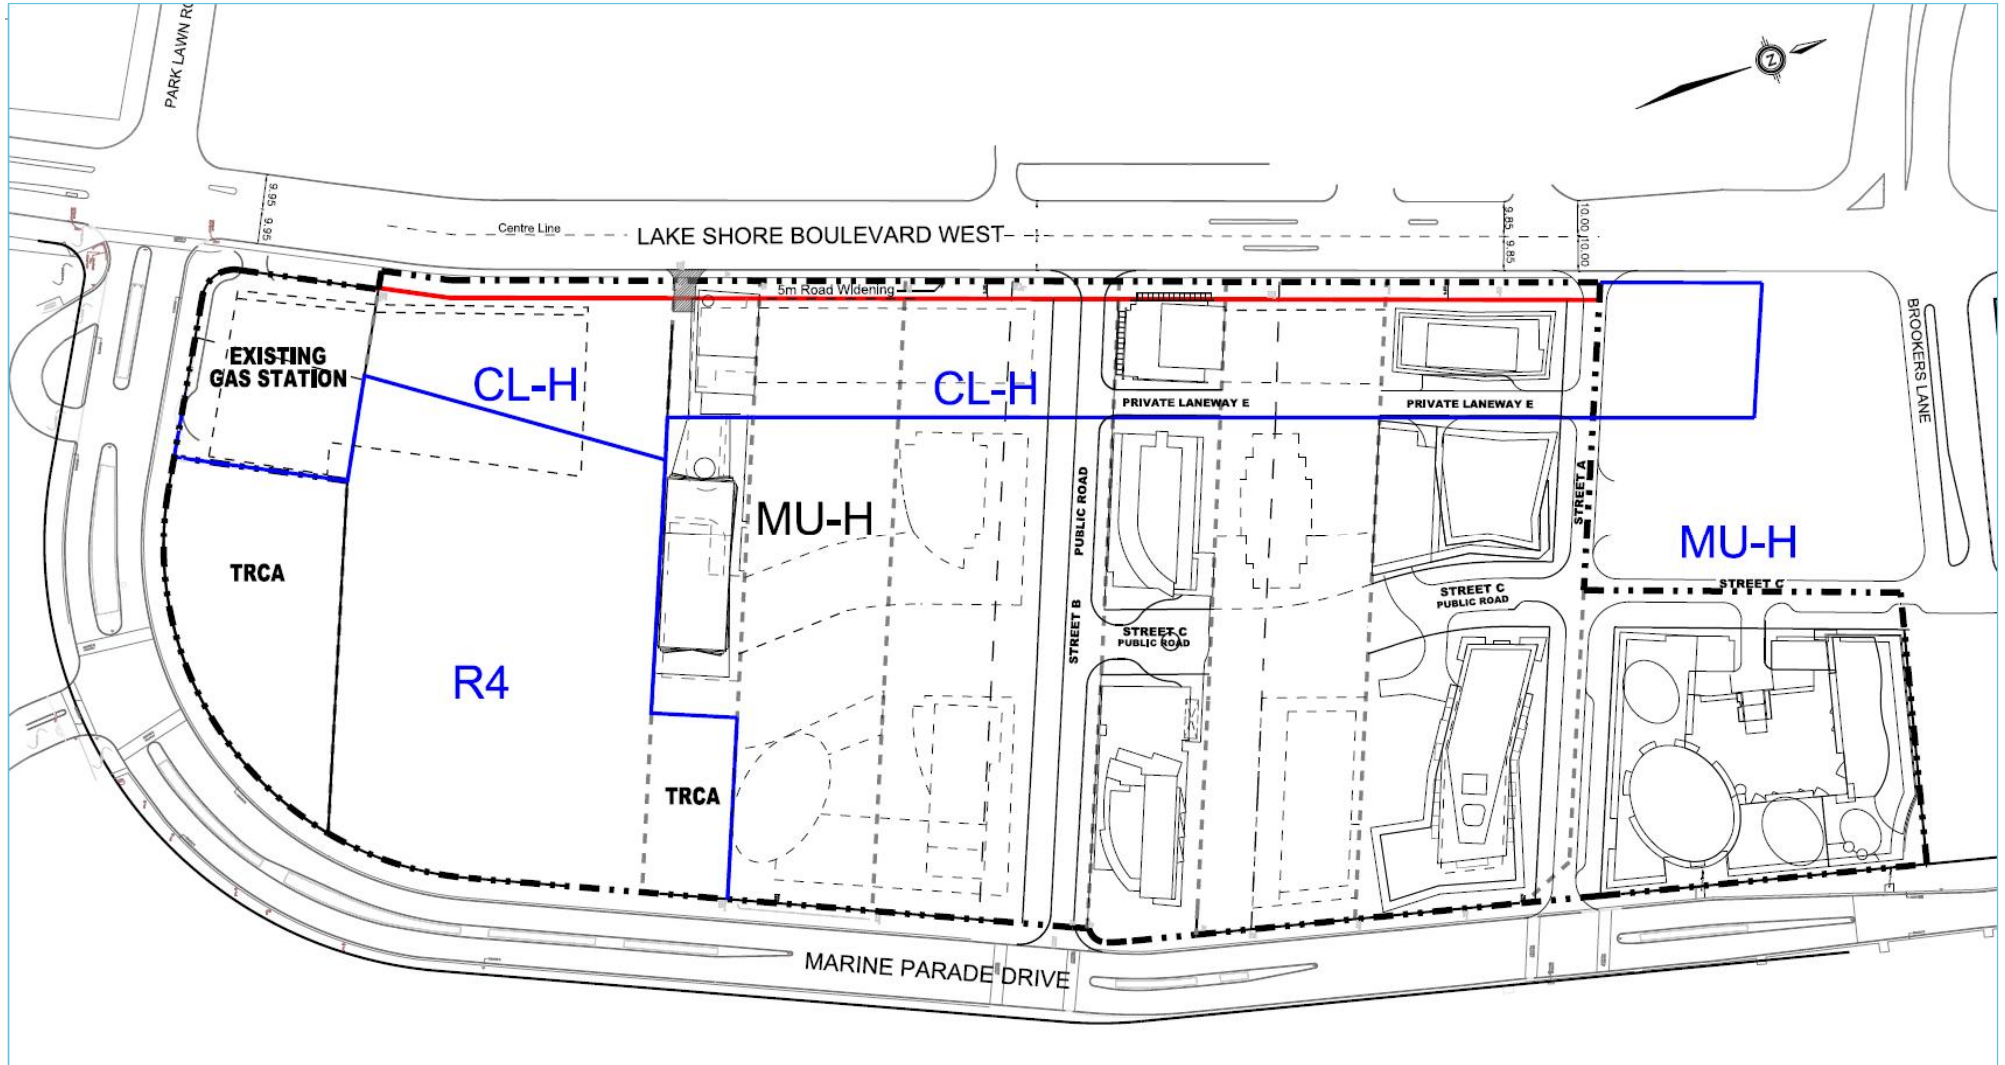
Humber Bay Shores Mixed-Use Developments, Proposed Interim Precinct Plan
